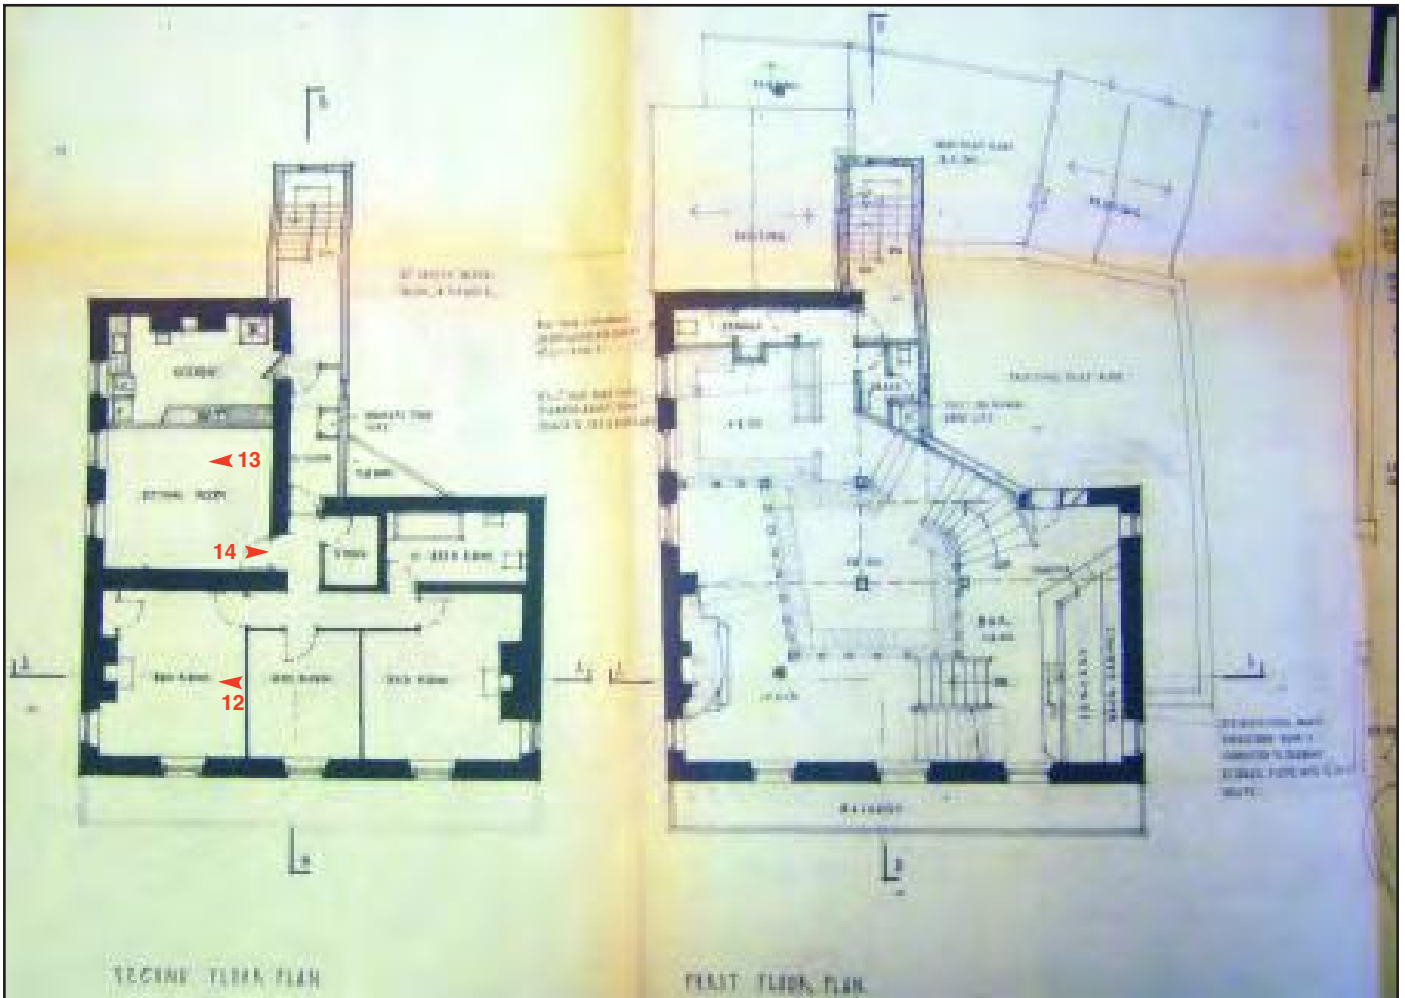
Architect's drawing dated 1973 showing first and second-floor alterations (BCC) and plate directions
